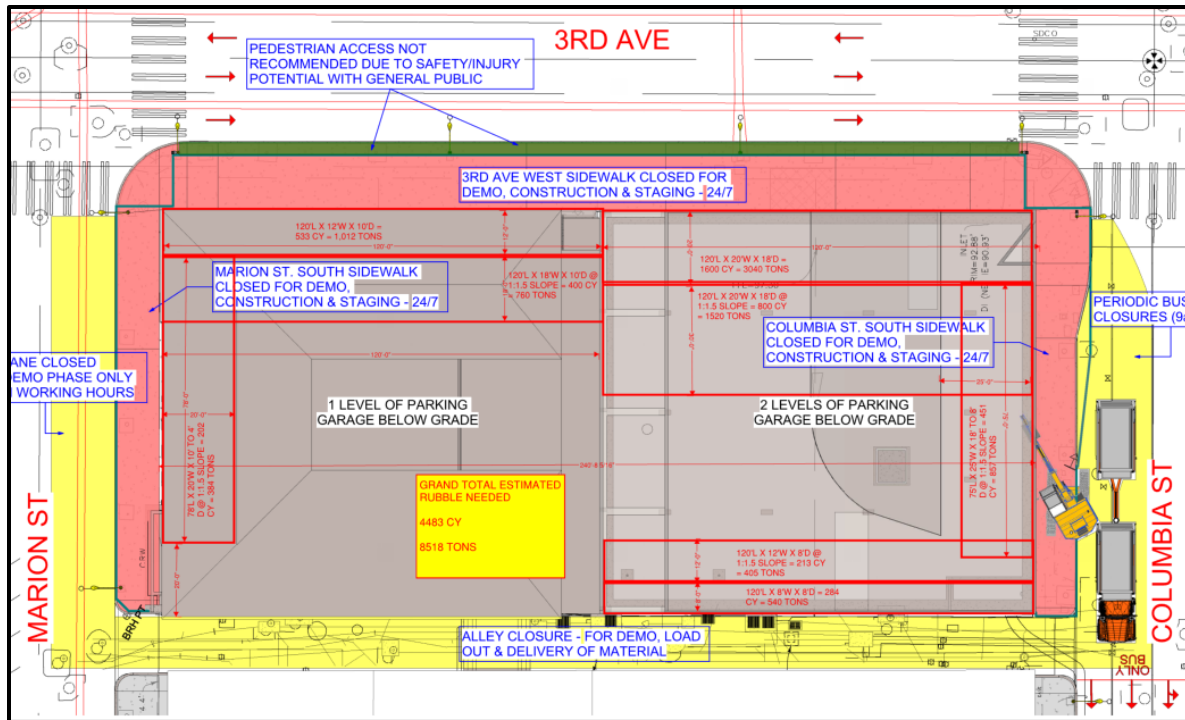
Preliminary Rubble Berm Layout – Actual Layout Not Yet Determined
